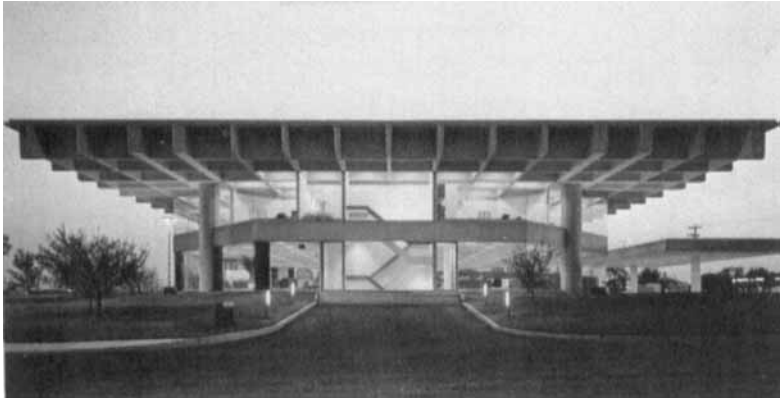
FRP is used in concrete forms to make extensive concrete structures such as these.
